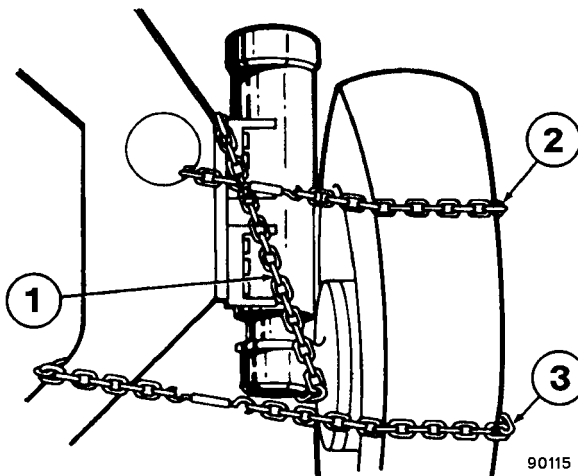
WHEEL SUPPORT CHAIN INSTALLATION
